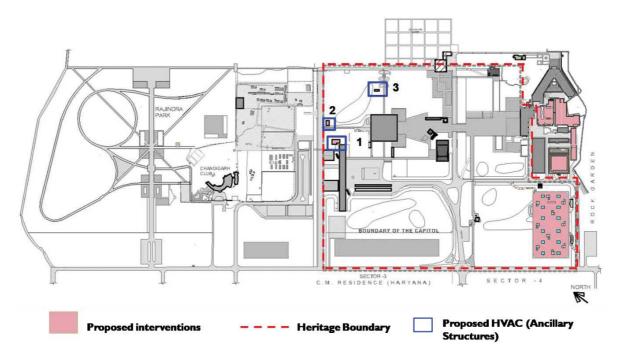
Site plan showing the proposed intervention in the Capitol Complex, WHS, © Chandigarh College of Architecture
